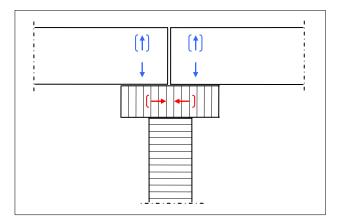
Primary beam with cross-section to enable internal stability against lateral torsional buckling, also capable to transfer external horizontal loads (e.g. wind loads)
